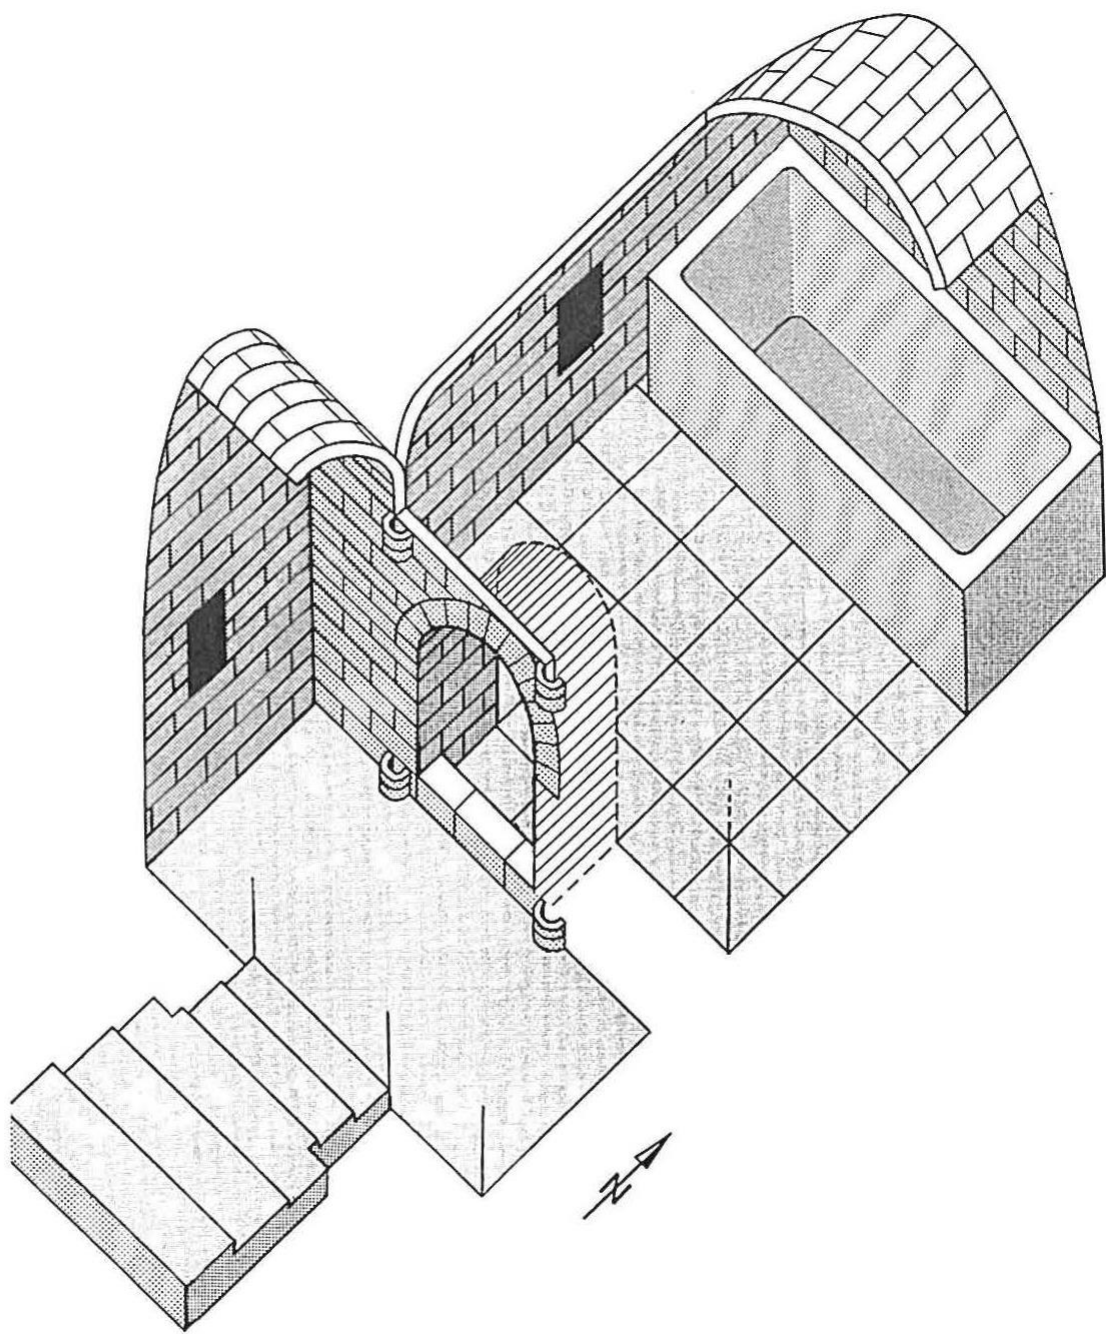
Plan of vaulted underground rooms beneath rooms 74, 75 (surveyed and drawn by Muzahim Mahmud Hussein).
